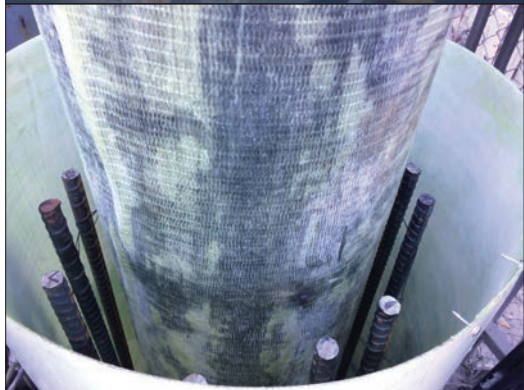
Reinforcement detail near the base showing the anchored steel, FRP laminate shell, and the finished installation
